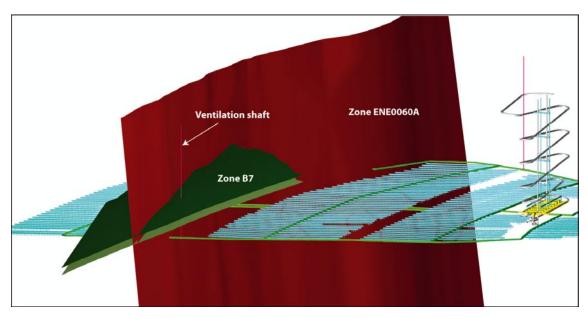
Illustration showing the intersection between eastern ventilation shaft (SA01) and B7 at a depth of 310 m (RHB 70). Underground facilities at -470 m (RHB 70). View from northeast.
